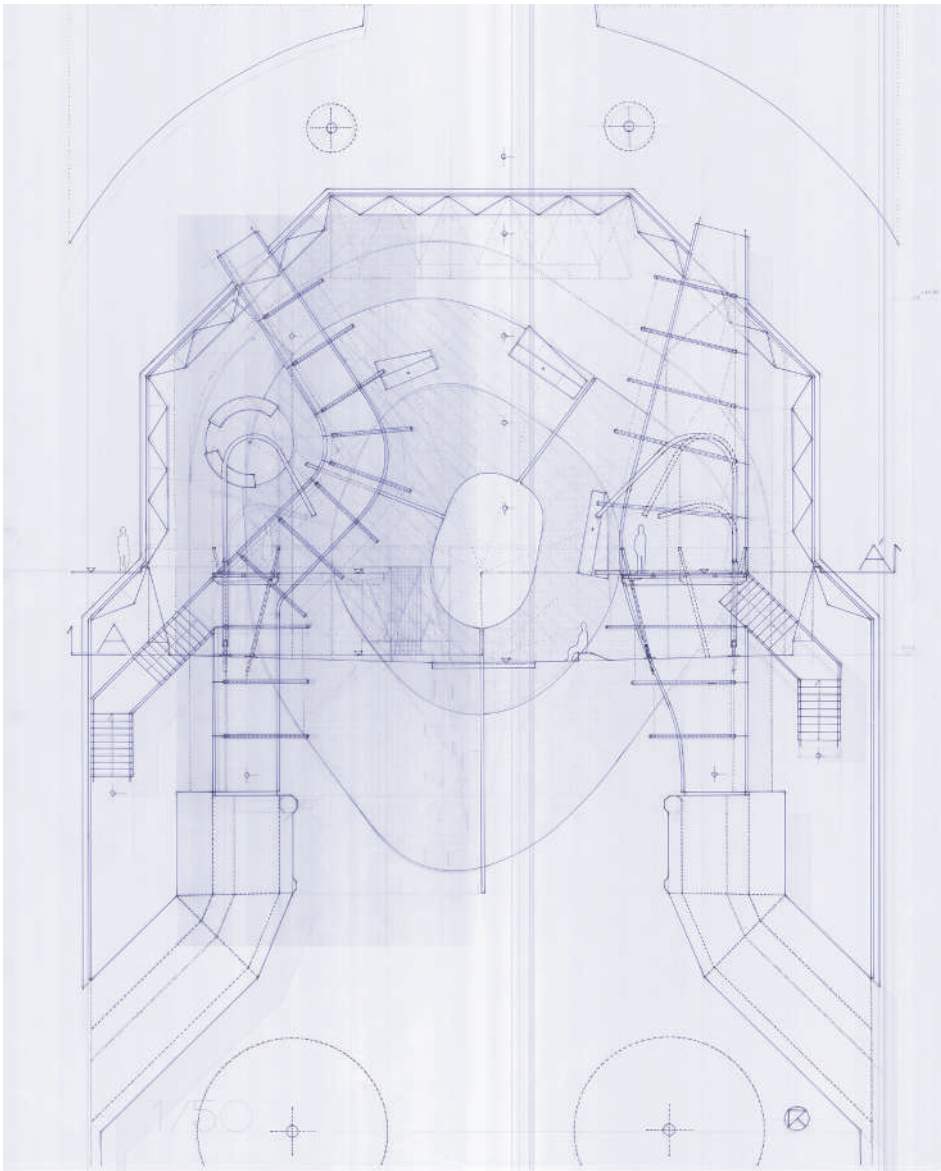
Overlaid plan, elevation and cross section of proposed intervention, drawn to scale 1:50. Ink on vellum.
